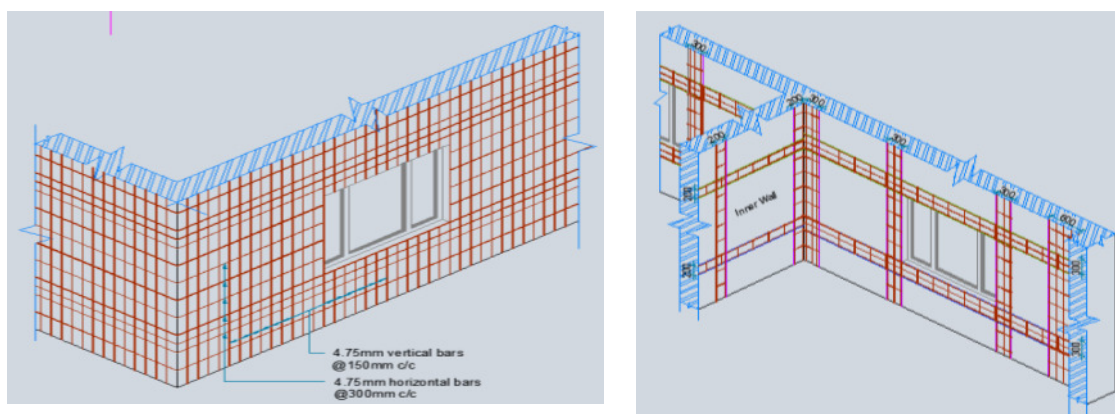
Retrofitting Option with full Jacketing in outer wall surfaces (left) and splint and bandage system in inner wall surfaces (right)
